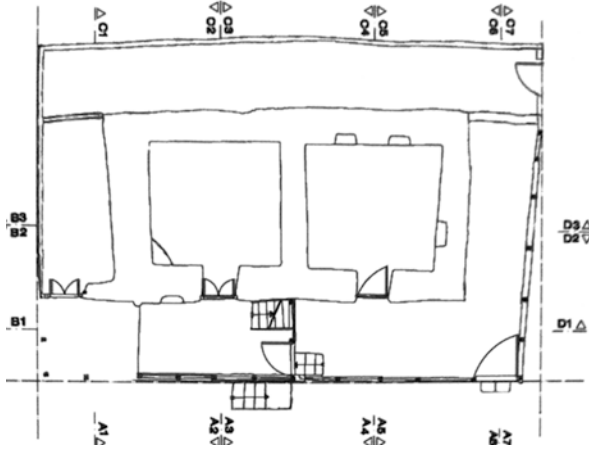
Moradi house, ground floor (Taleghani 2011a, b)
